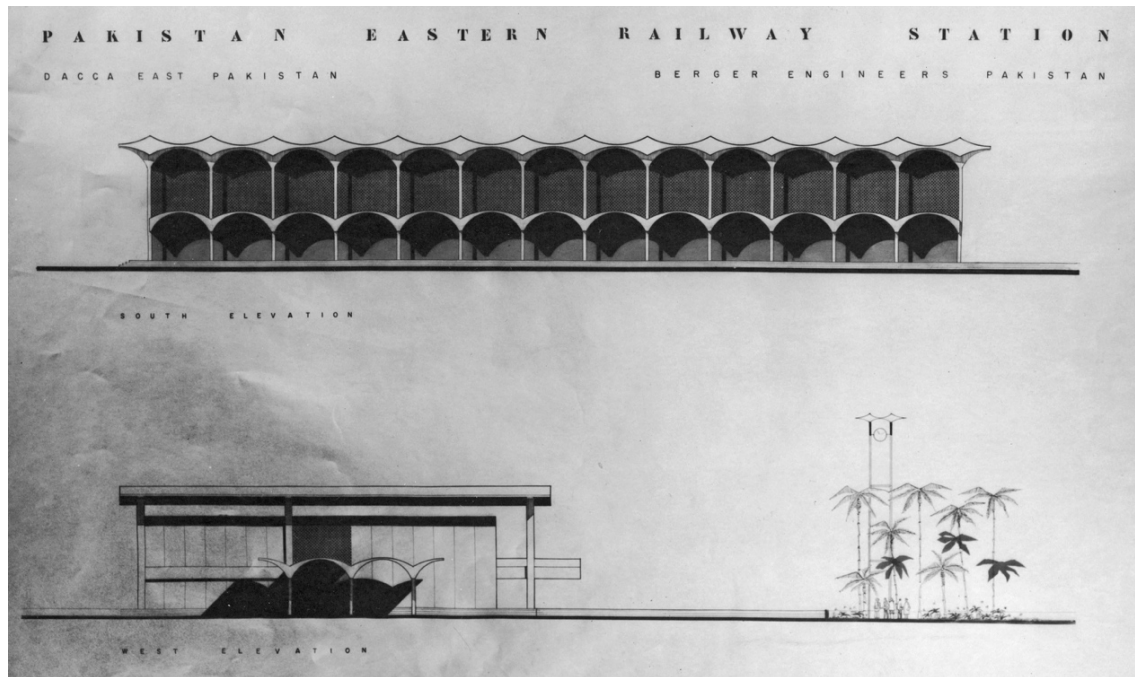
Vaulted Roof, Elevation of the Kamalapur Railway Station. (Source: Katherine Dunham)
